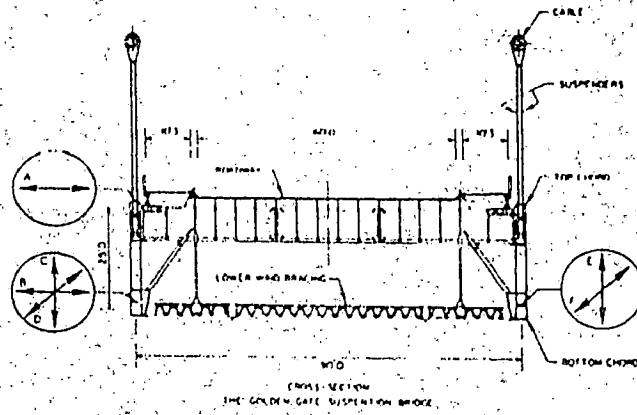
Positions and Orientation of Six Accelerometers at Typical Cross Section of Suspended Structure
